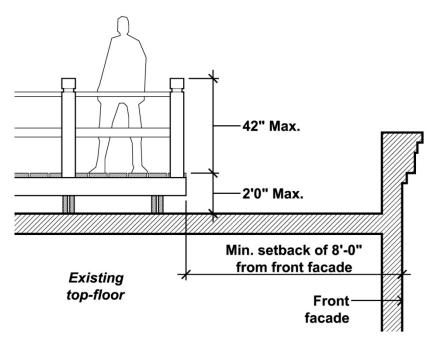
(C) Roof Deck Height and Setbacks
